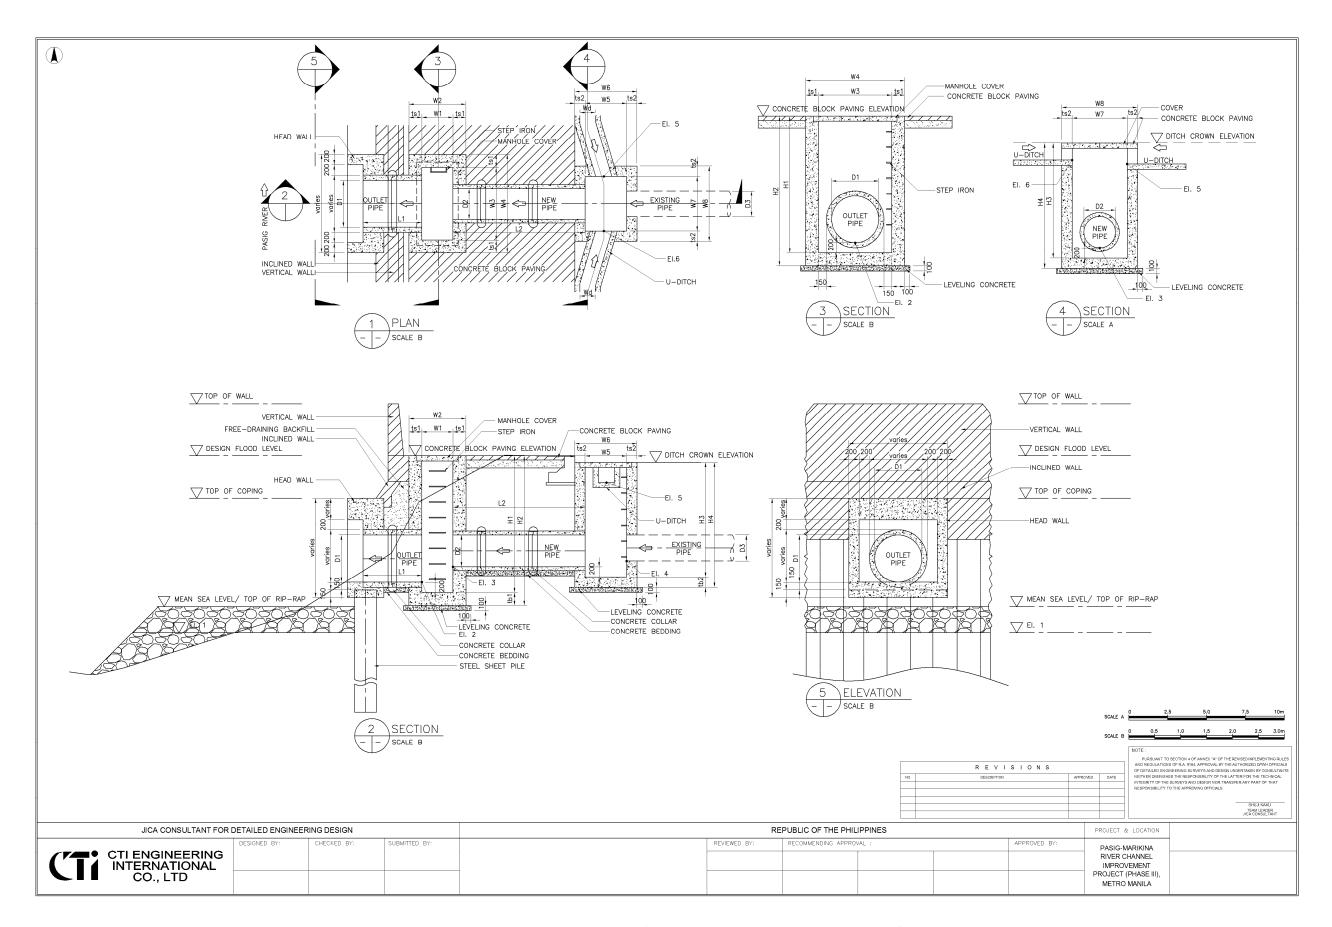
Typical Drawing of Drainage Facility in Pasig River (1/2)
